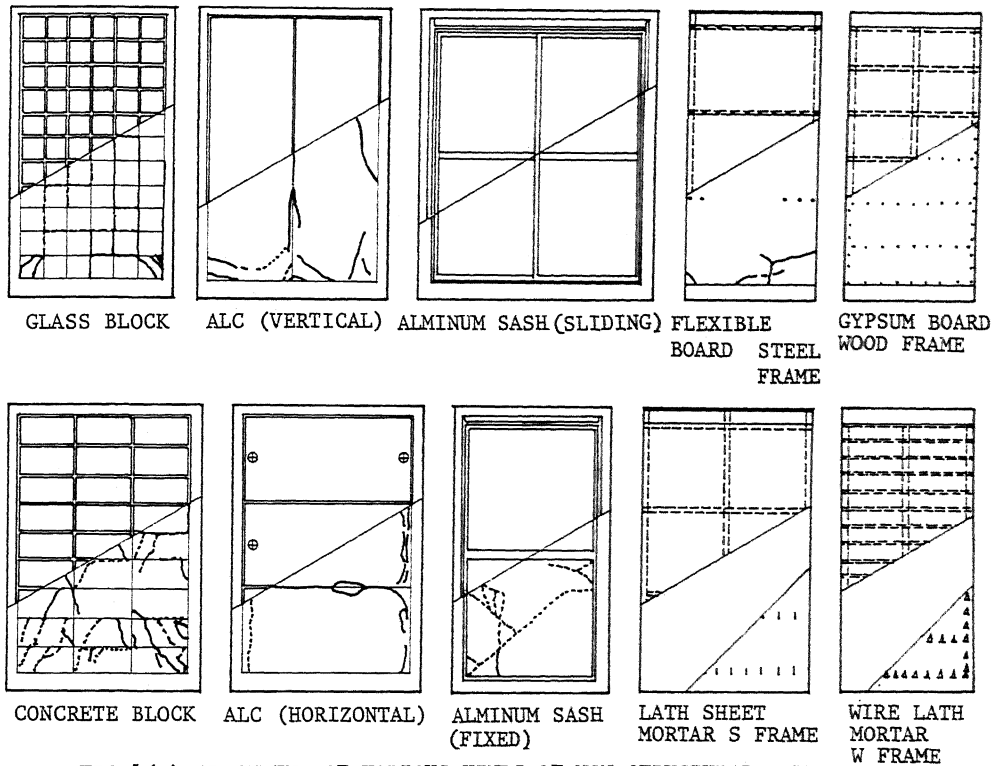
(a) SPECIMENS OF VARIOUS KINDS OF NON STRUCTURAL WALLS
